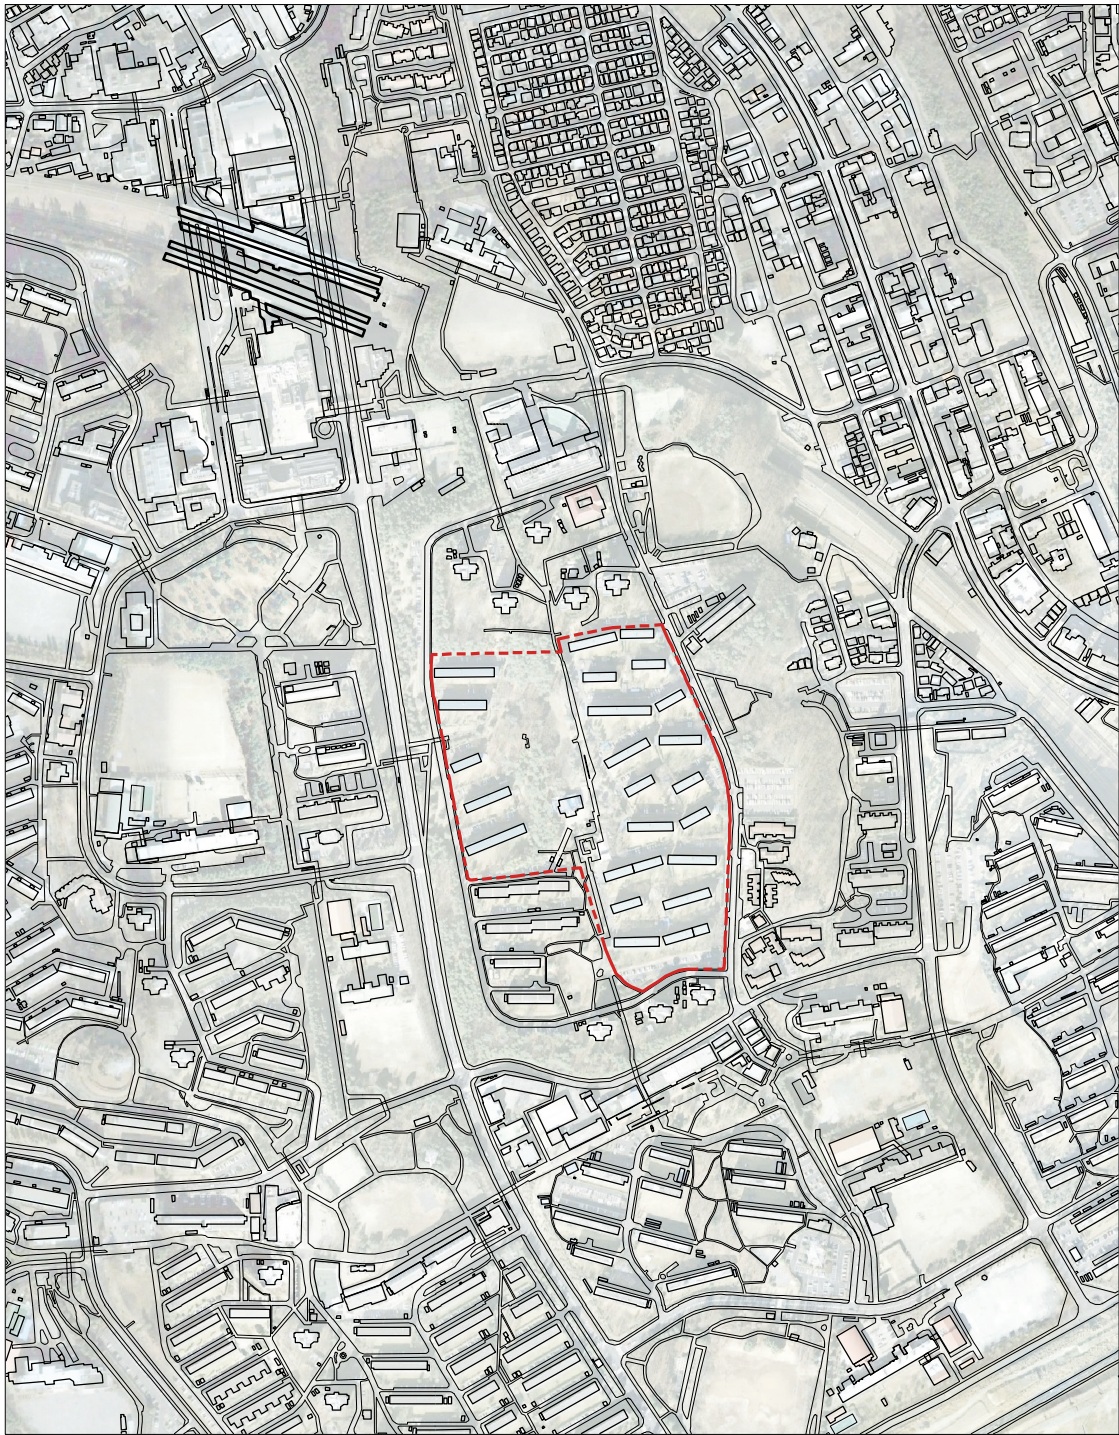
Site plan of Suwa 2-chome Housing before reconstruction
